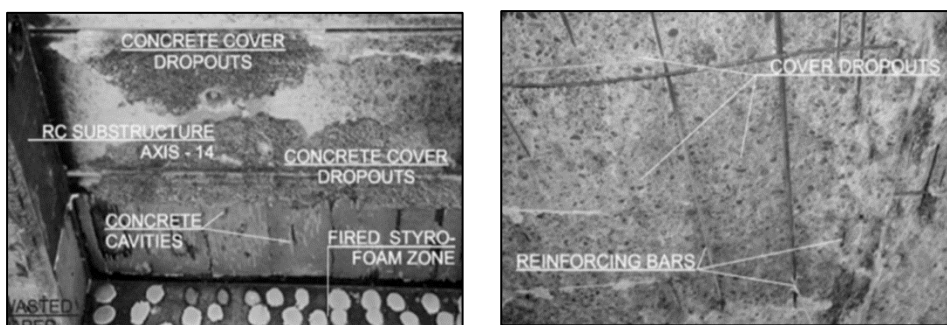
Detail floor slabs damage: left figure-Cover local defects and right figure- Peel-off concrete cover in reinforcing bars region (Knyziak et al., 2019).
